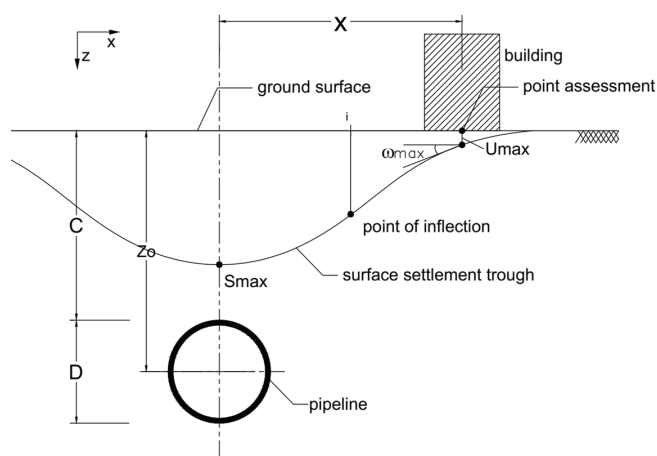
Surface settlement and effects on existing surface building when pipejacking
